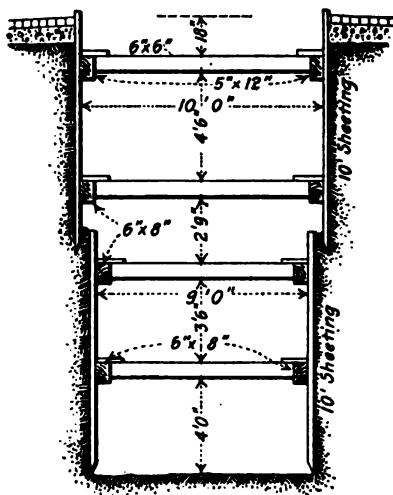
Vertical sheeting for 6-½-ft. sewer.
